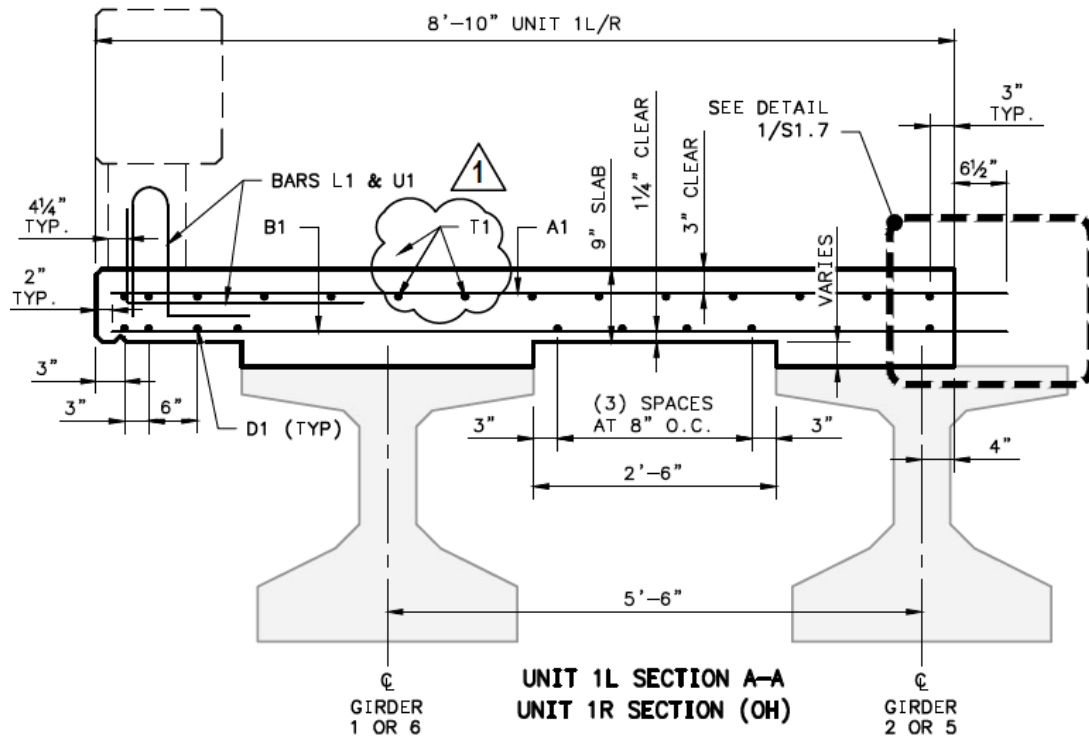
Prefabricated Concrete Decked Girder Assembly
